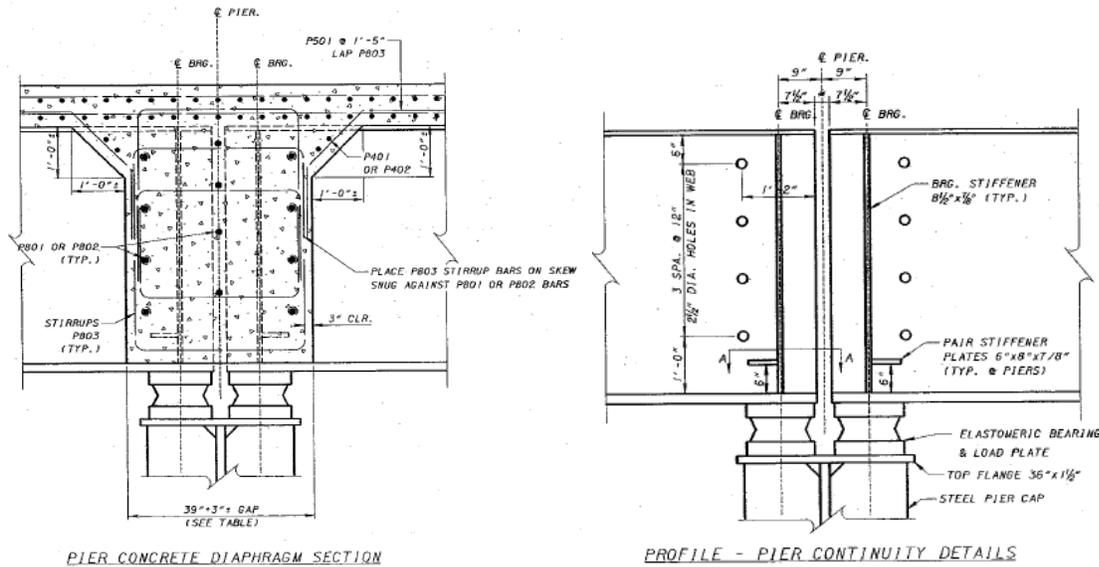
Concrete diaphragm details at pier on Scioto River Bridge [13].
